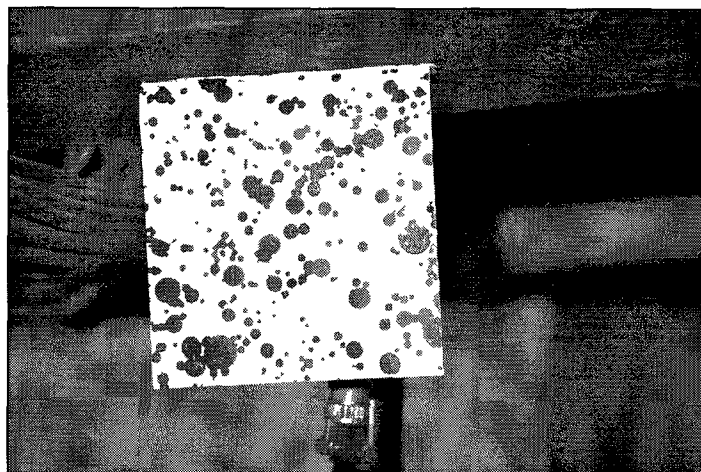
A cut of sheet metal with a speckle pattern (tab) attached to the bottom flange of a beam.
